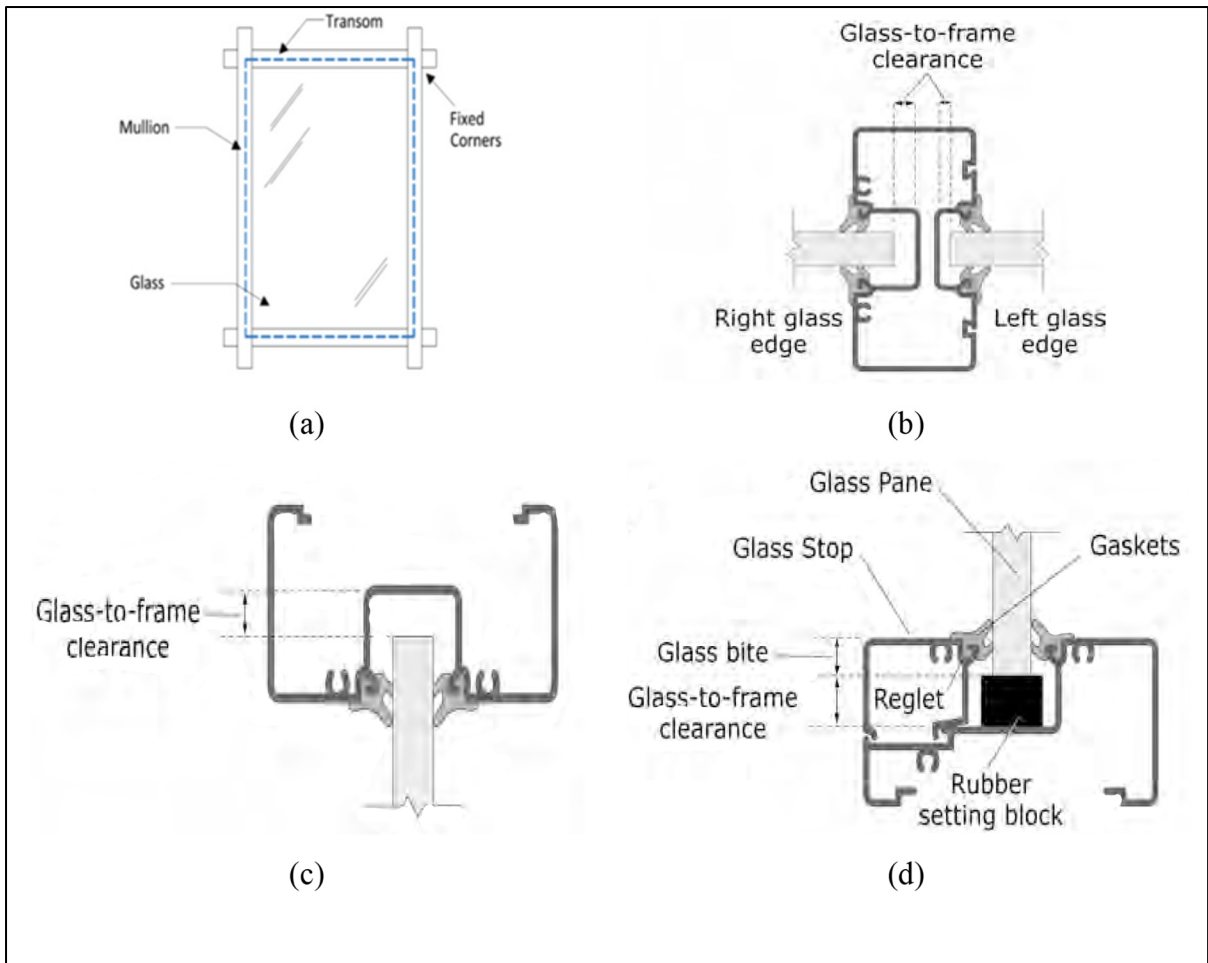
Typical curtain wall: a) glass and frame configuration; b) Mullion section and connection detailing; c) Transom head and connection detailing; d) Transom sill and connection detailing
